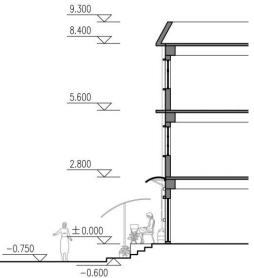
Section c12-c12 1:150 (Source: Drawn by the Author)
